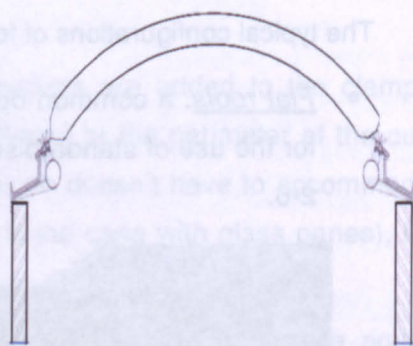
Two way curved roof. [Building example: John Madejski Academy, Reading Berkshire, UK, Architects: Wilkinson Eyre Architects]
